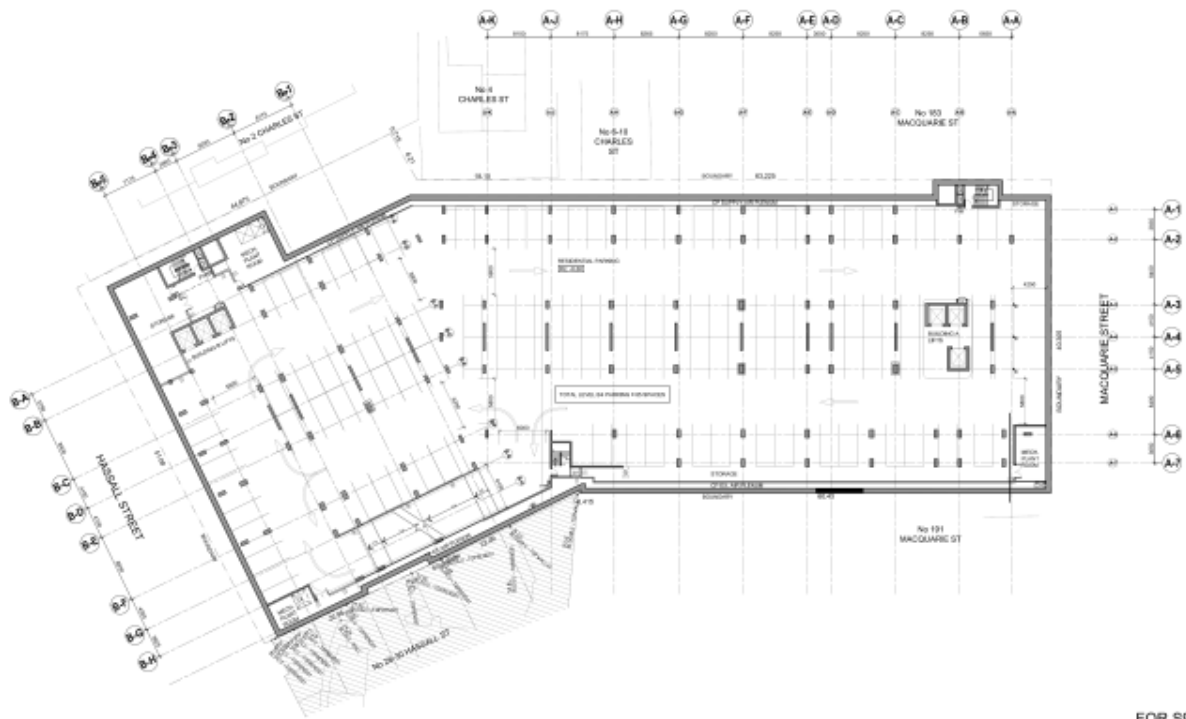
Proposed Basement Level 4 Plan (Residential Car Park) (Source: KTA, 2015)
